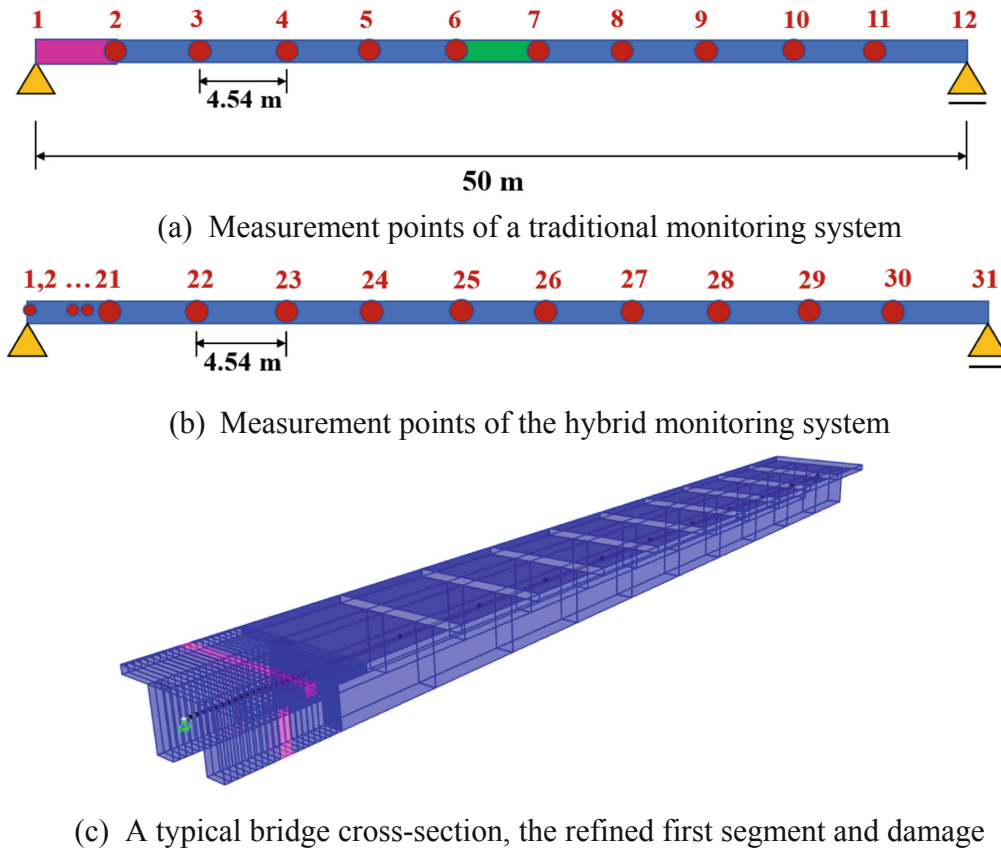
(a) Simply-supported beam representation, and (b) exemplary bridge cross-section and (c) damage location at the refined segment
